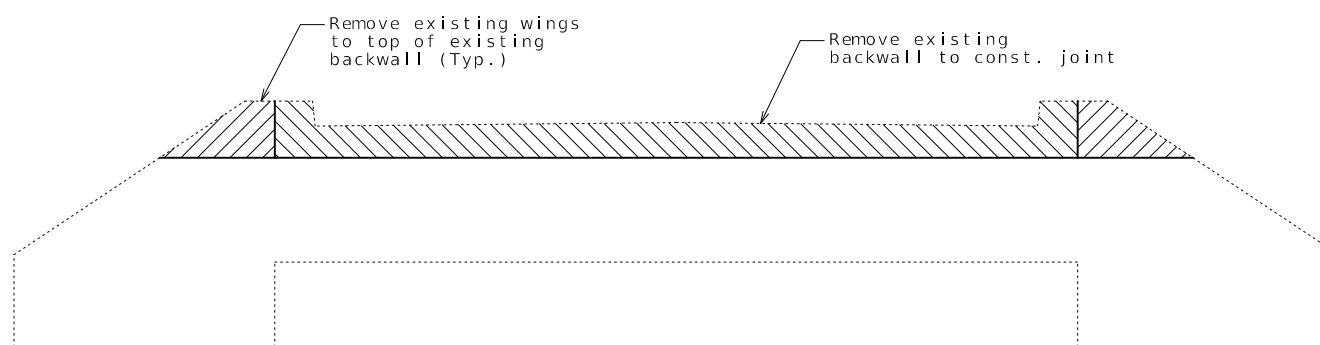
DETAILS OF CONCRETE REMOVAL AT END BENT NO. 1
